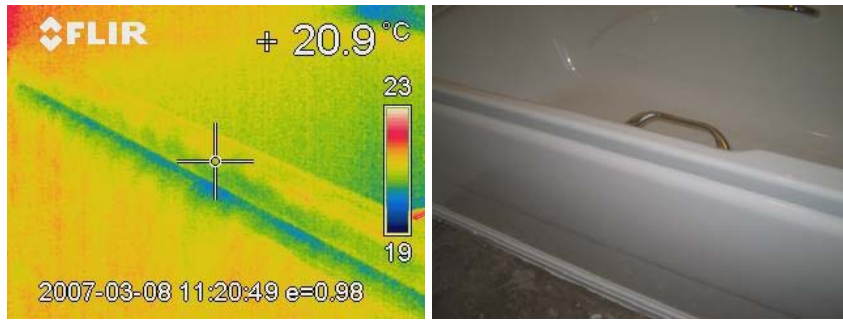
Colder air entering around the bath panel in the first floor bathroom.
